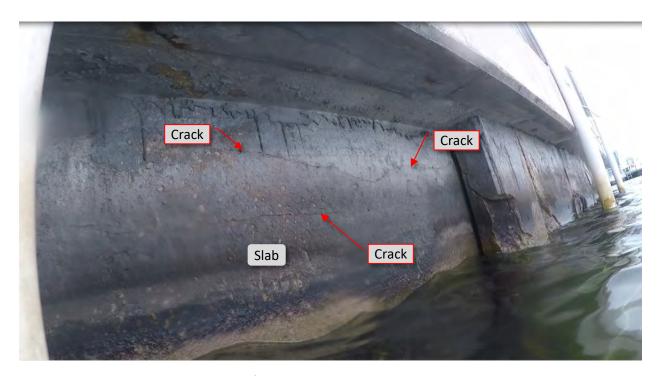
S23. STA 5+57 - 5+63. Crack at top of slab.
